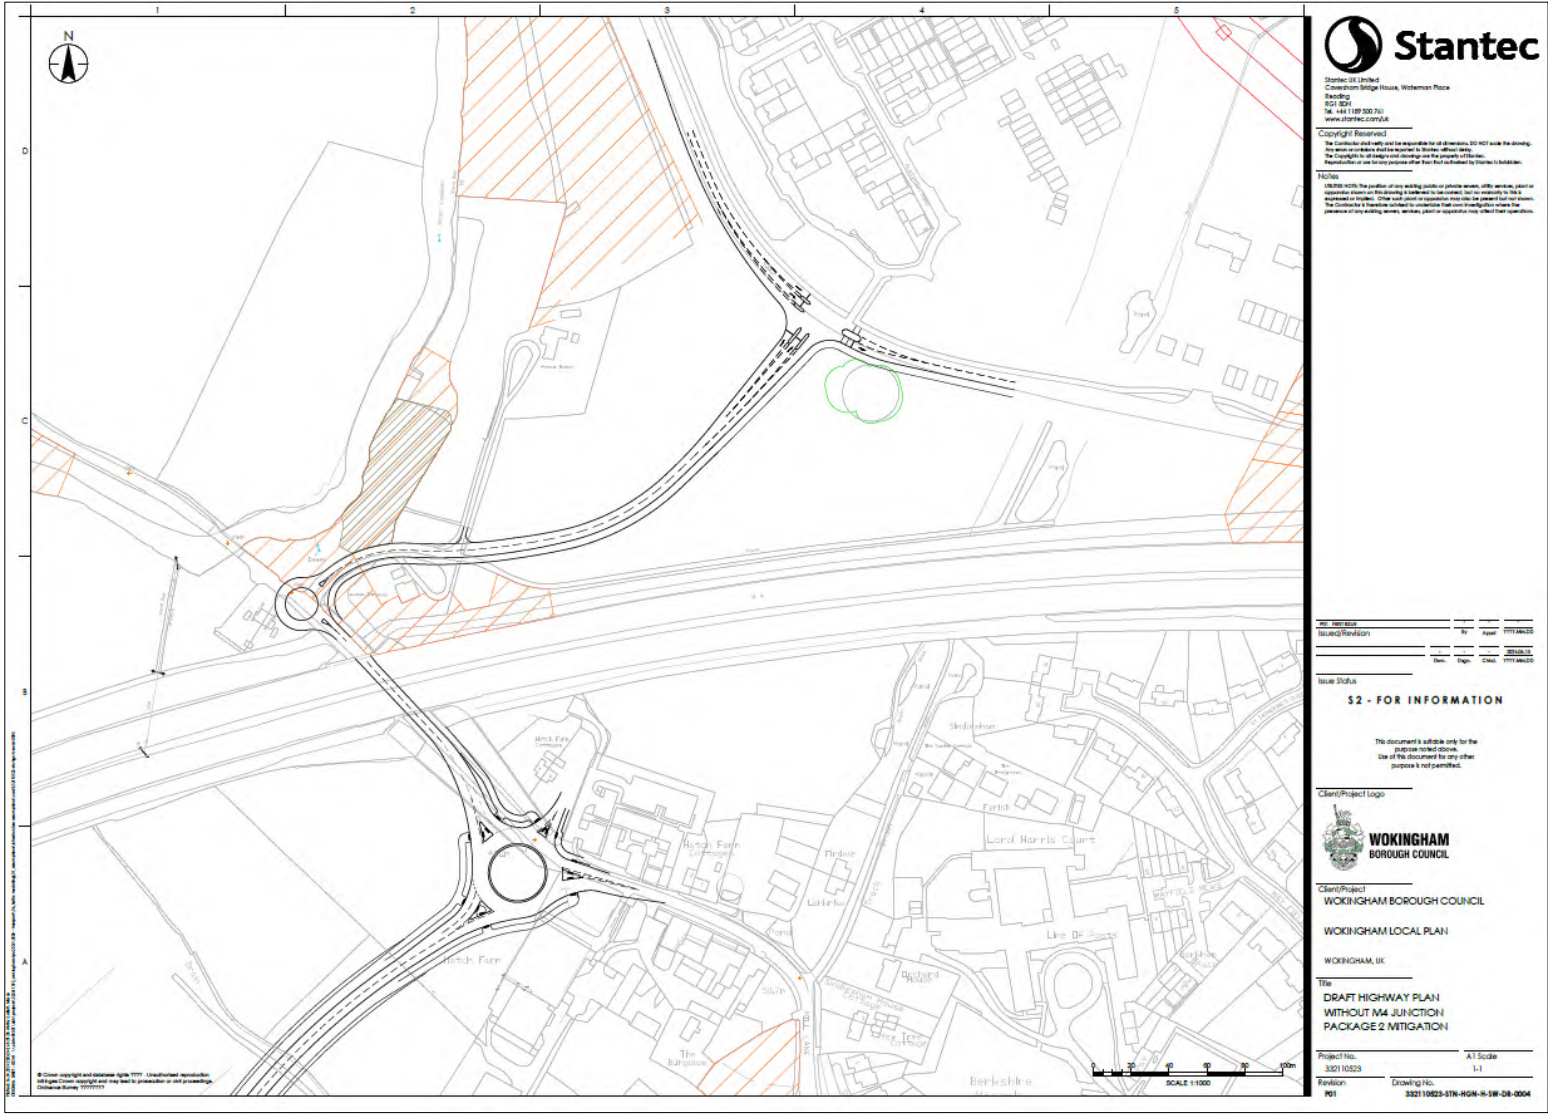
New access to Mill Lane and Connection to Winnersh Relief Road
